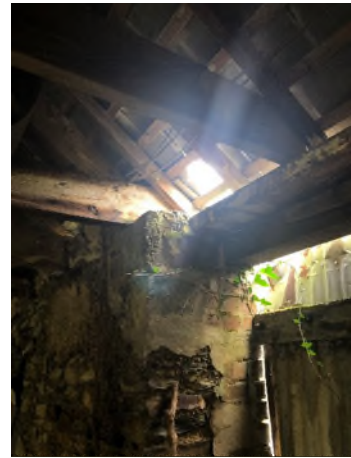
Internal image of where the roof joins the wall above the main door (door 01).
